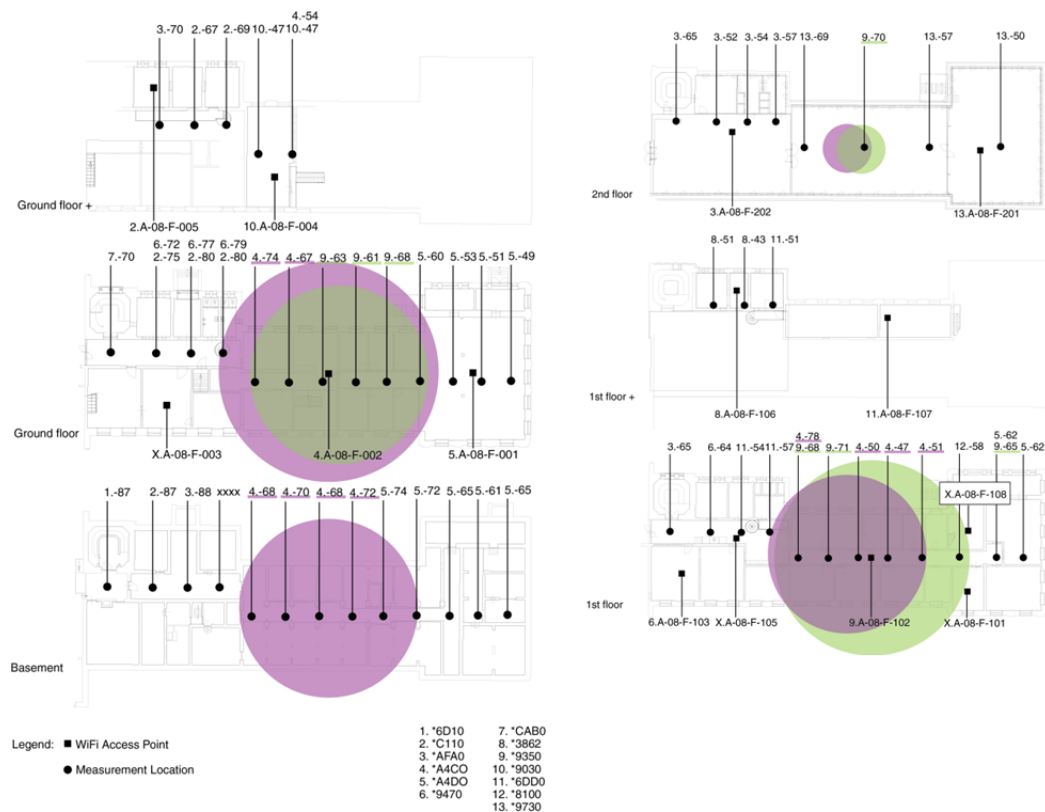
AP Connectivity in Architecture North West Wing, AP 4 and 9.
